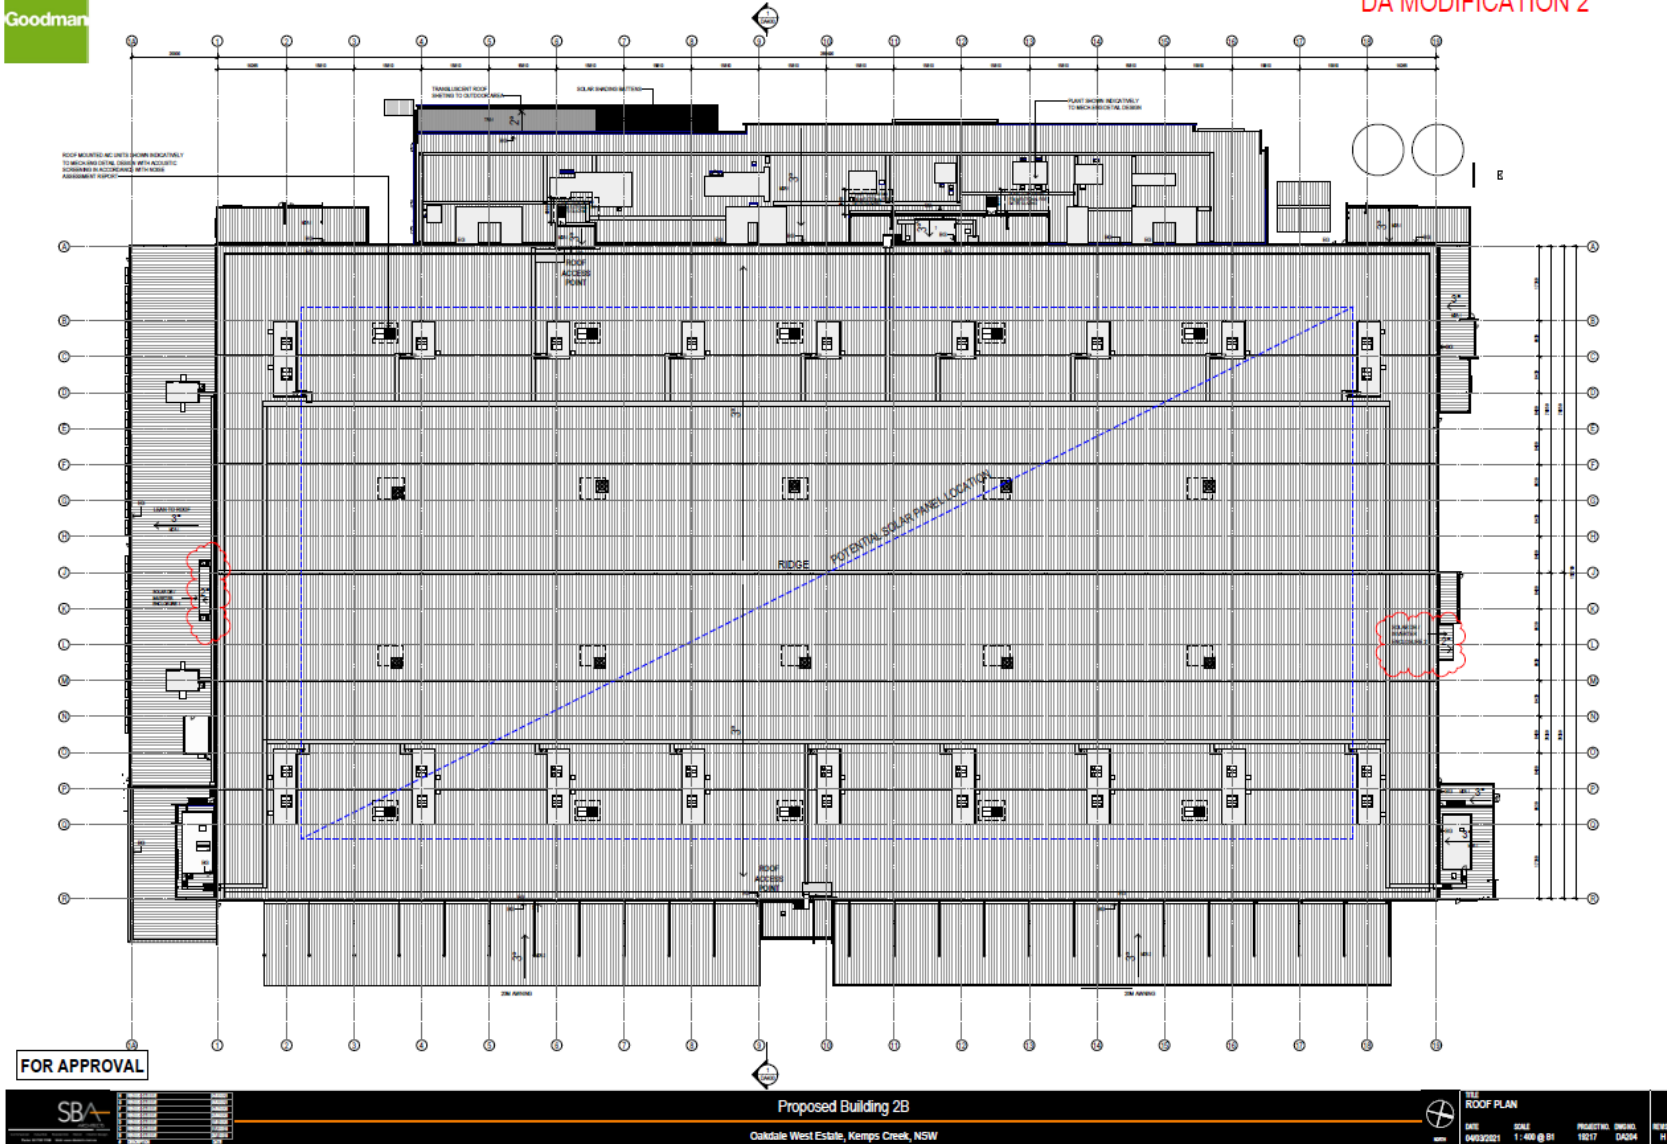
Roof Plan (Mod 2 – Plan 3 of 4)
